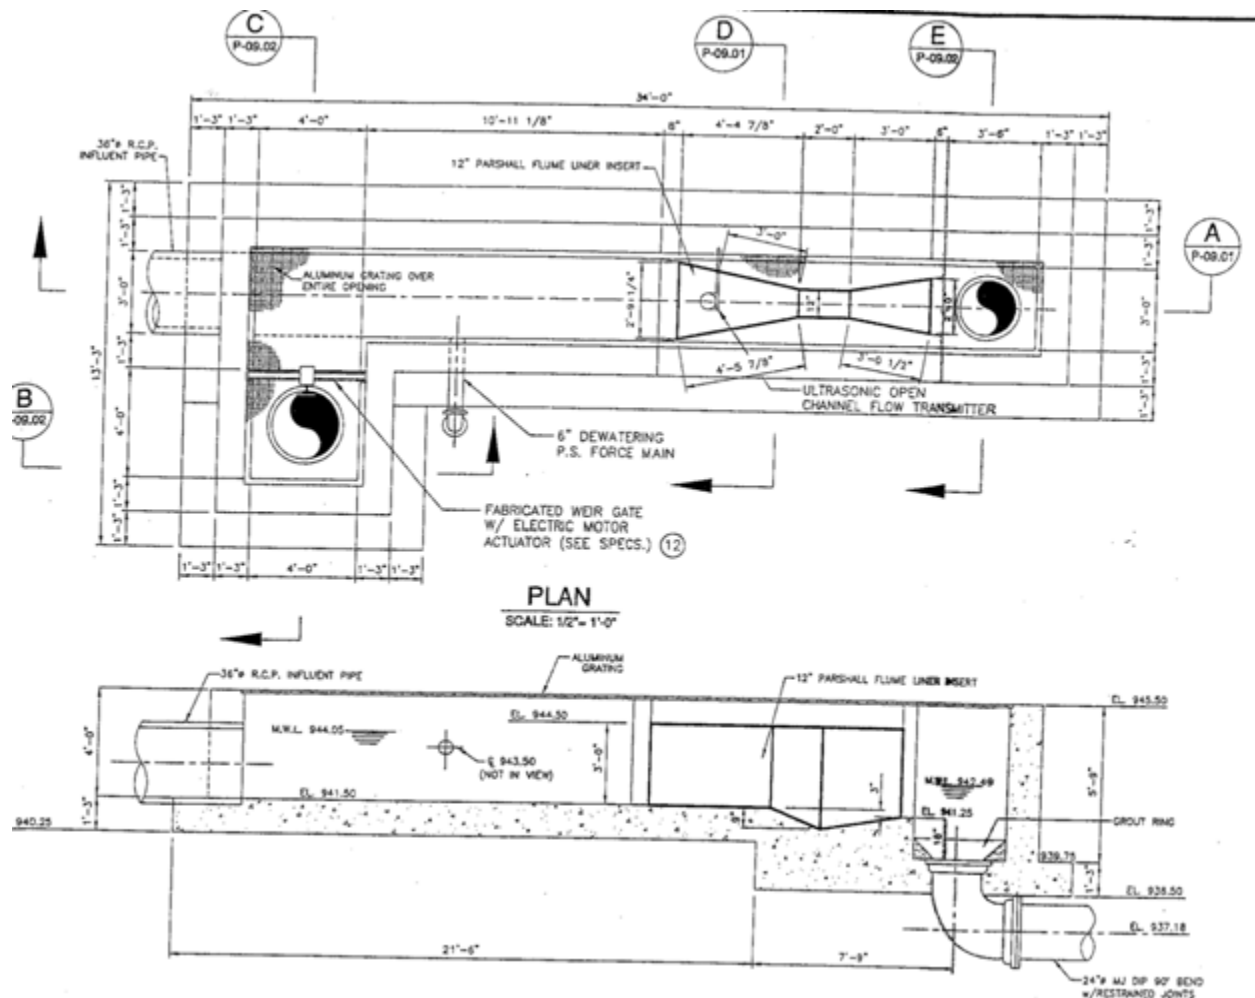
Flow Measurement and Diversion Structure: Plan and Longitudinal Section
